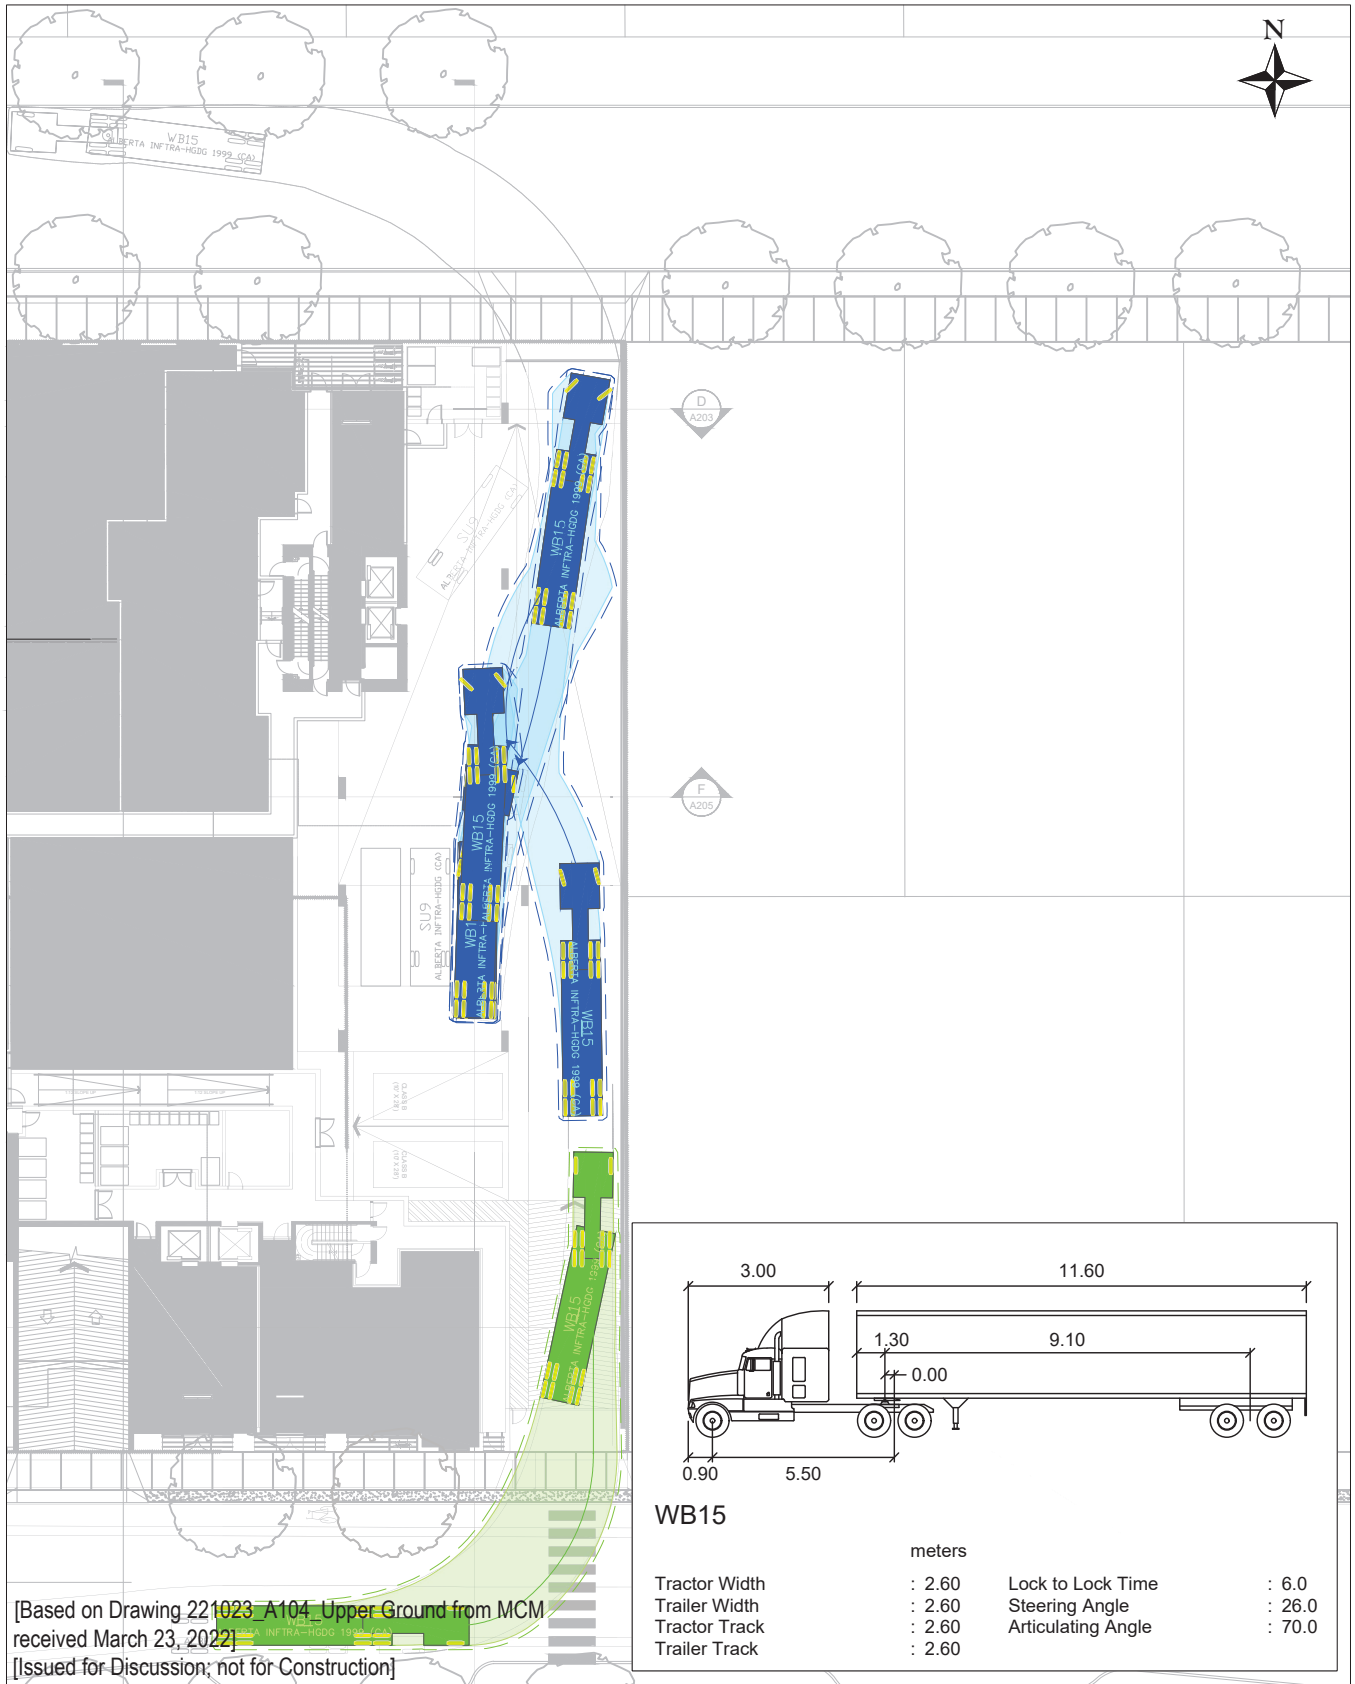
Laneway Loading - Class B Exit Movements
